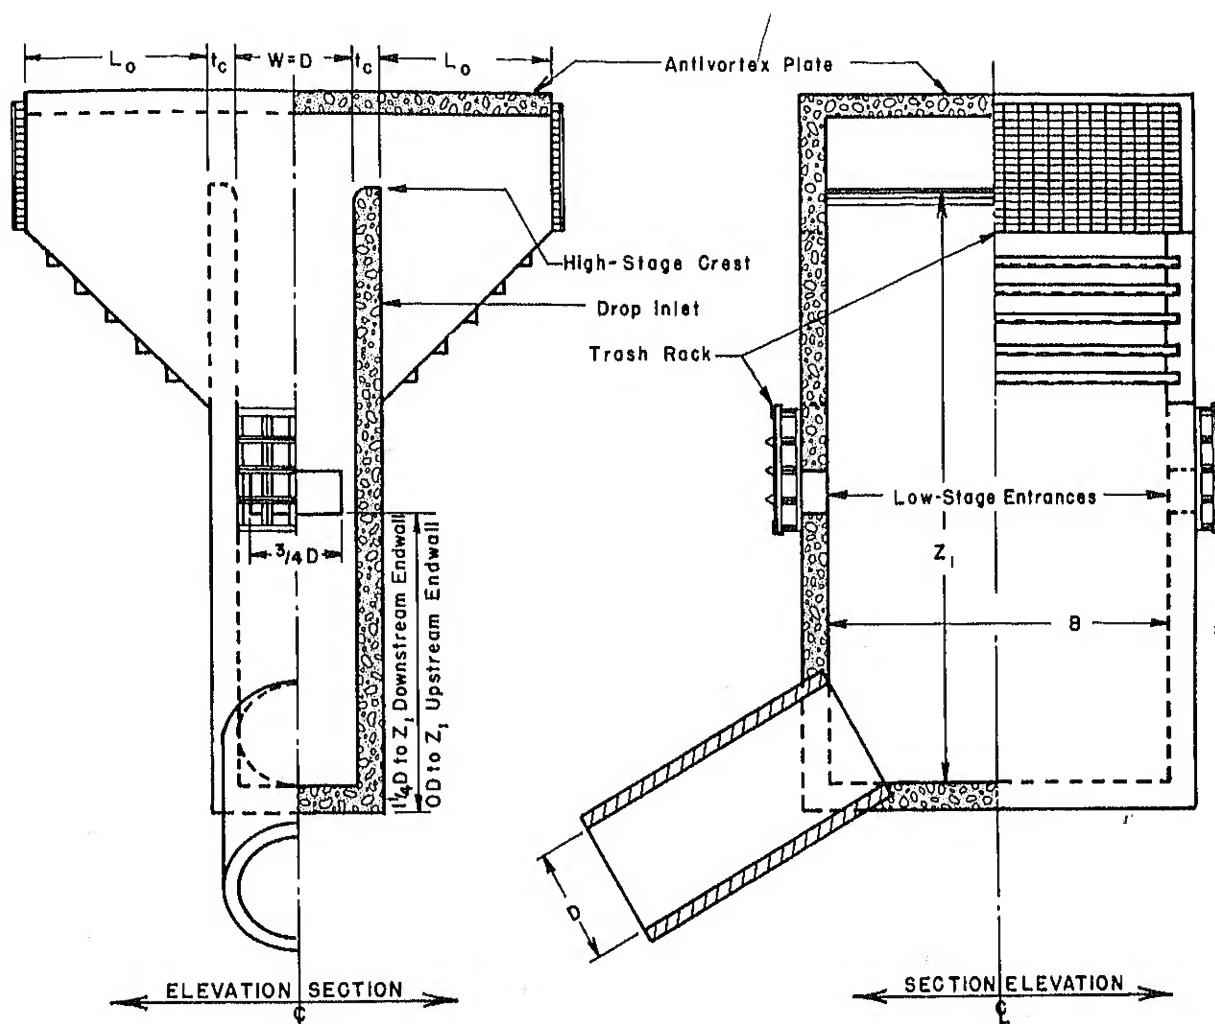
Two-stage, two-way drop inlet closed conduit spillway entrance.
